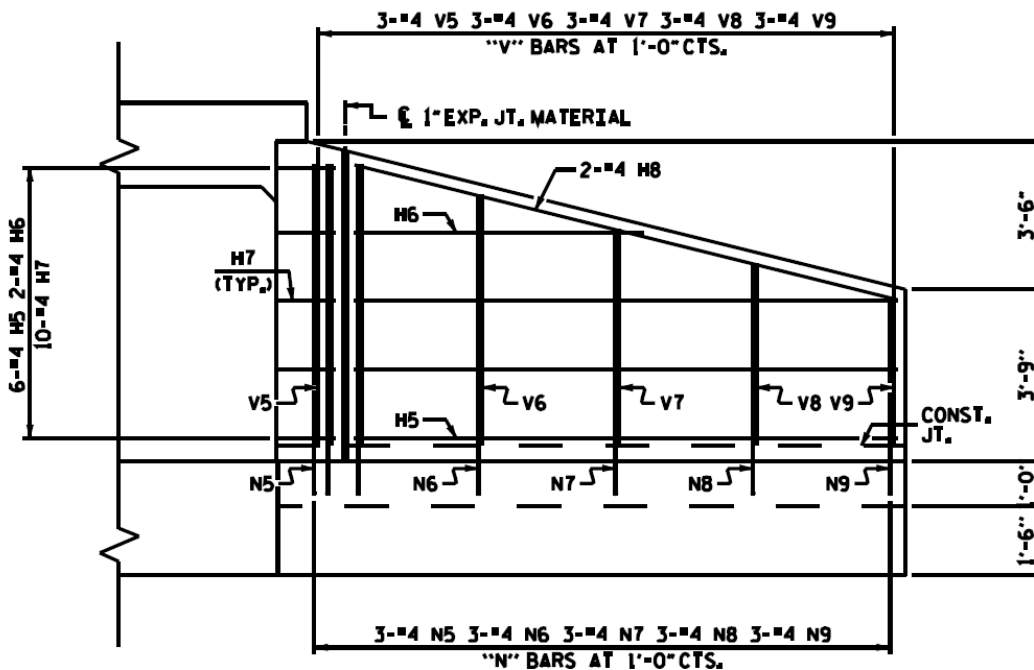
NCDOT Wingwall Expansion Joint Location (NCDOT 2007)
